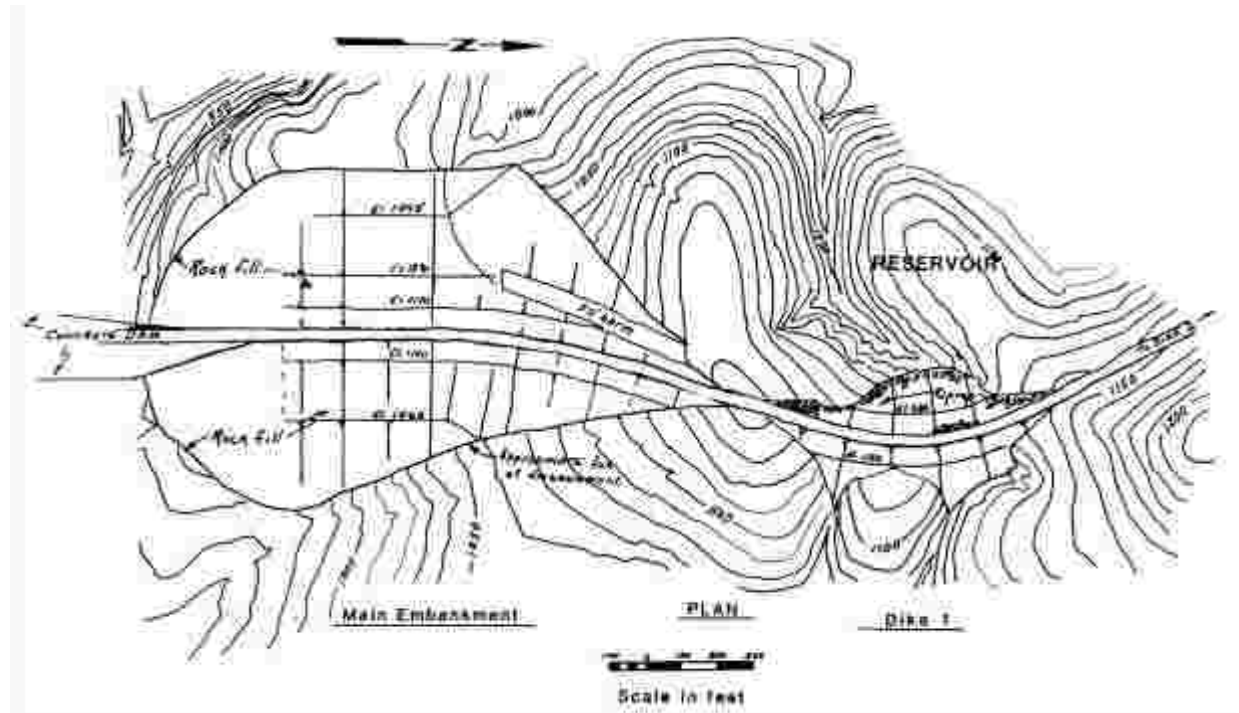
Beaver dam: Location of Dike 1 relative to concrete dam and main embankment (Bruce & Stefani, 1996)
